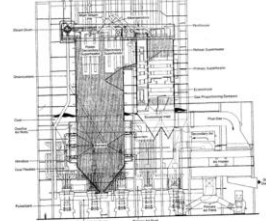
General arrangement of coal-fired industrial pressure water boiler (City, Ashcroft & Moore Co.)
